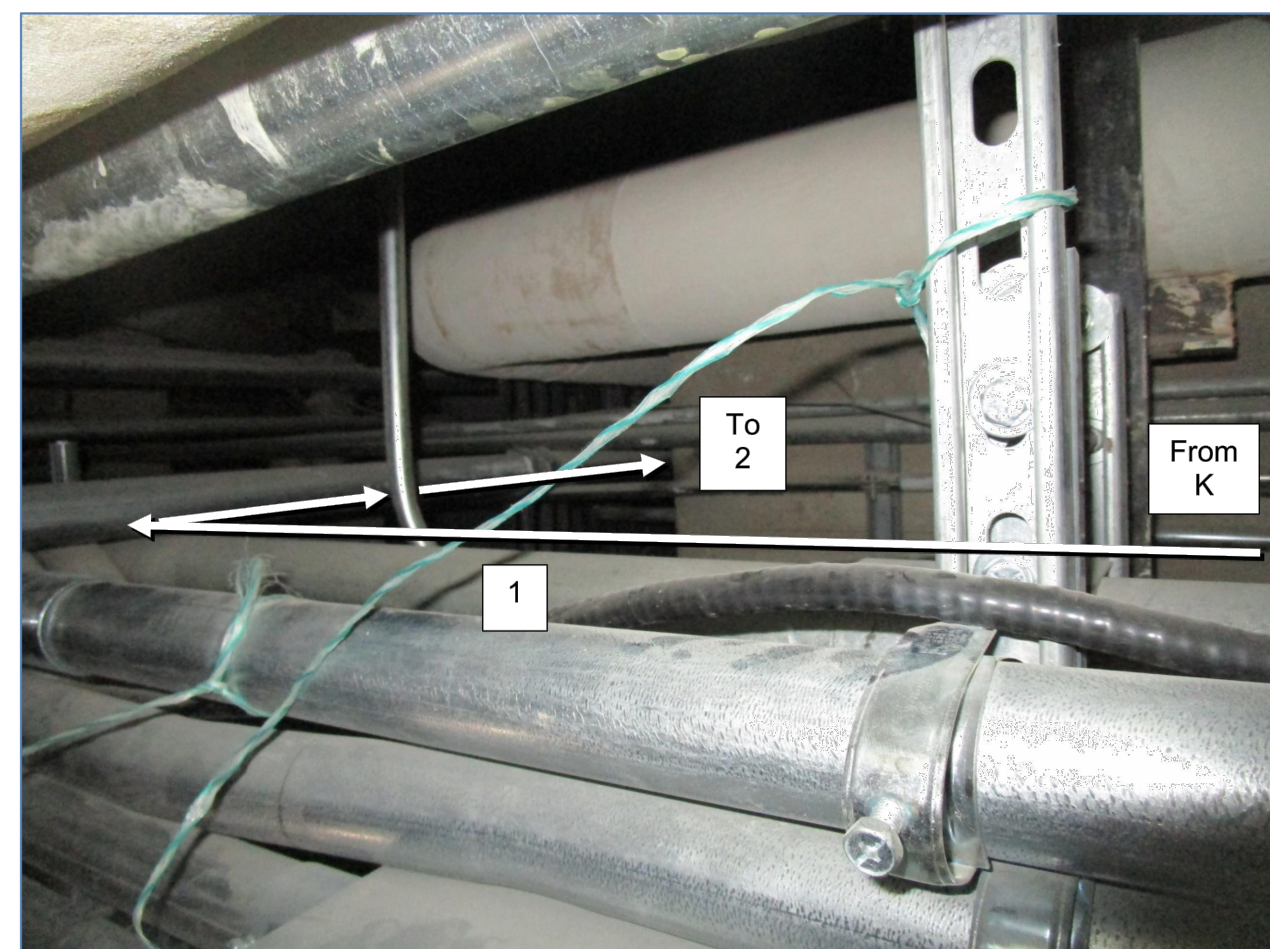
Location L, bend around corner and into tunnel beneath dome (View 1)
